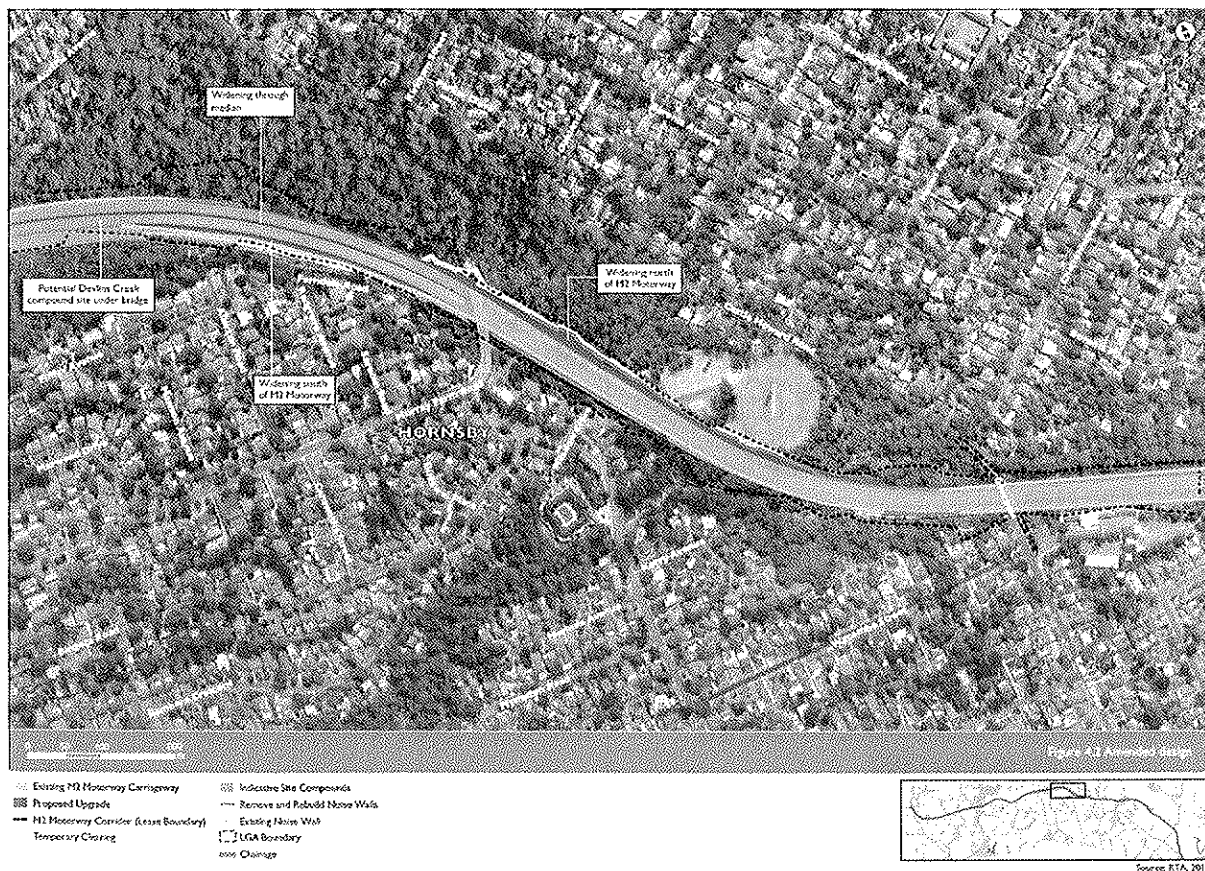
Amended Design of Kirkham Street/Murray Farm Road Overbridge Area (Source: M2 Upgrade Submissions and Preferred Project Report, NSW Roads and Traffic Authority August 2010)
